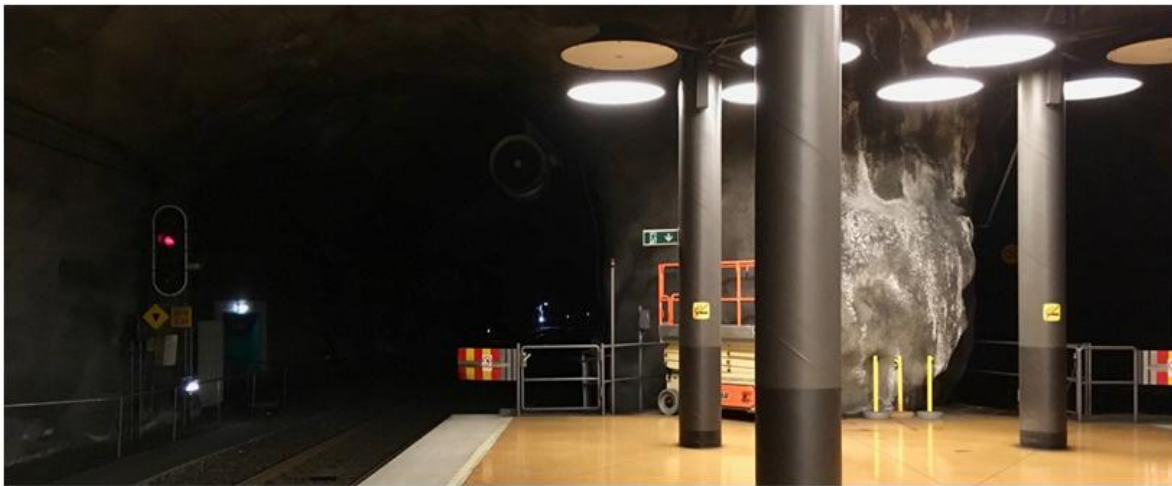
Rock pillar at transition between the station platform cavern and the track tunnels. Photo: Lars M Hansen
